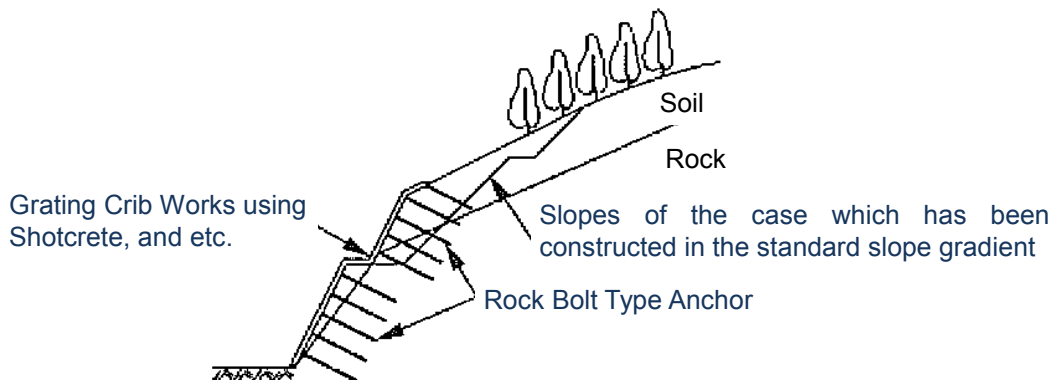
EXAMPLE OF ROCK BOLT TYPE ANCHOR
